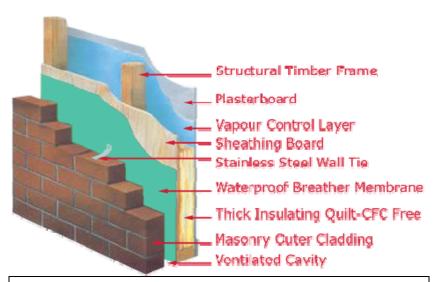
Breakdown of a Standard Wall (Source: www.energystar.gov)
